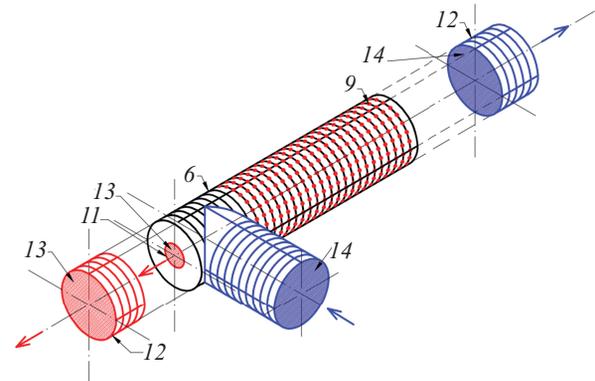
Axonometric view of a combined recuperator with an exhaust air intake for use in mechanical ventilation systems
